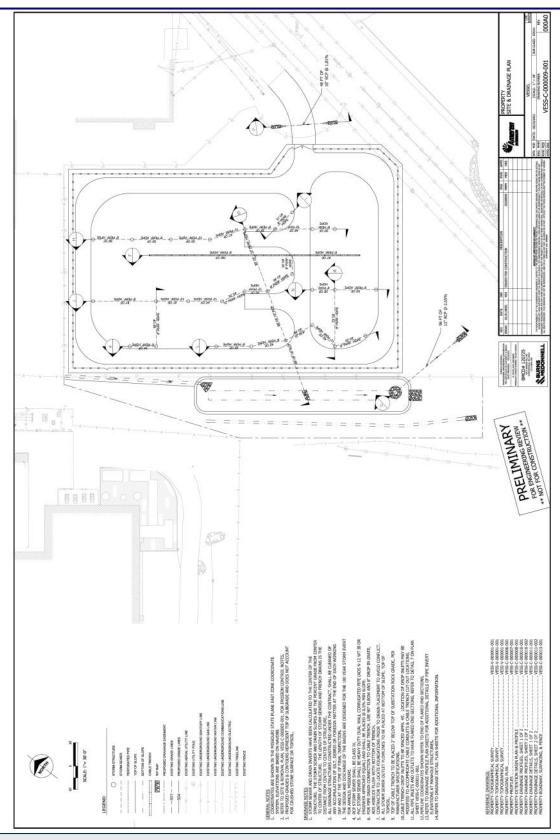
EXHIBIT B: CIVIL PLANS, 4 (SITE & DRAINAGE PLAN)
